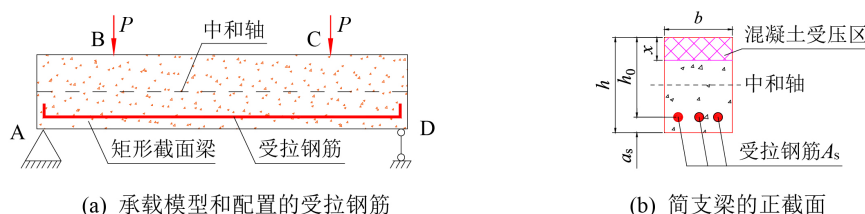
Simply supported beam with singly reinforced rectangular cross-section
